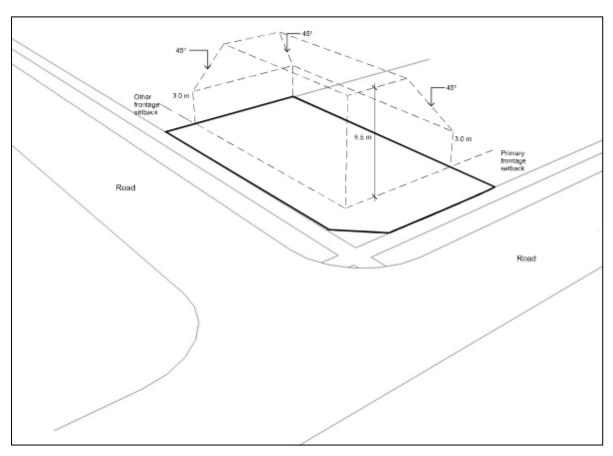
Excerpt of Figure 8.3 - Building envelope as required by clause 8.4.2 A3(a) and clause 8.5.1 A2(a)
